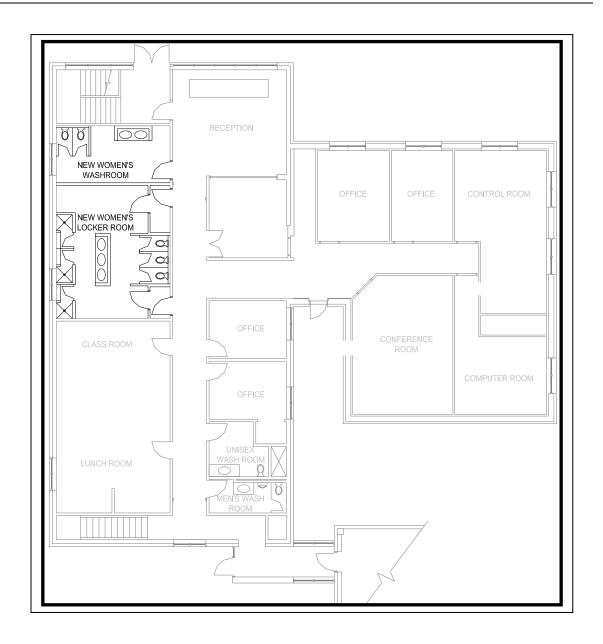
Proposed New Women's Locker Room and Washroom Layouts – Main Floor
